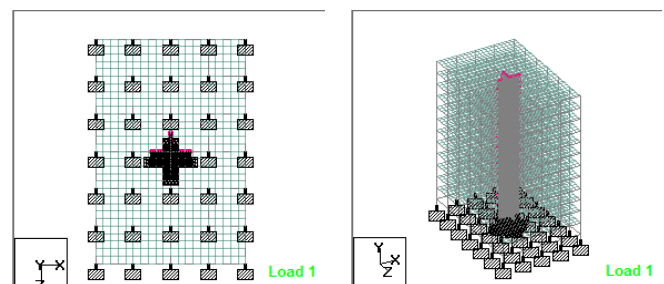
Typical Plan and 3D view of External Shear Wall at Mid Frame (ESXZ4M)
